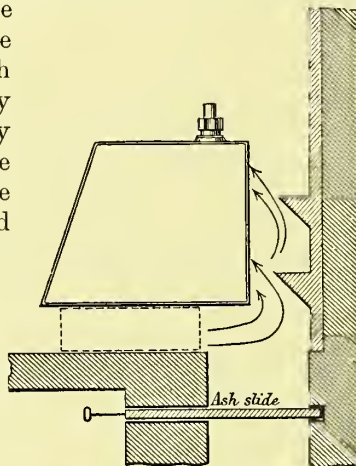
Block Boiler with Cast-iron Back Plate and Ash Tray
